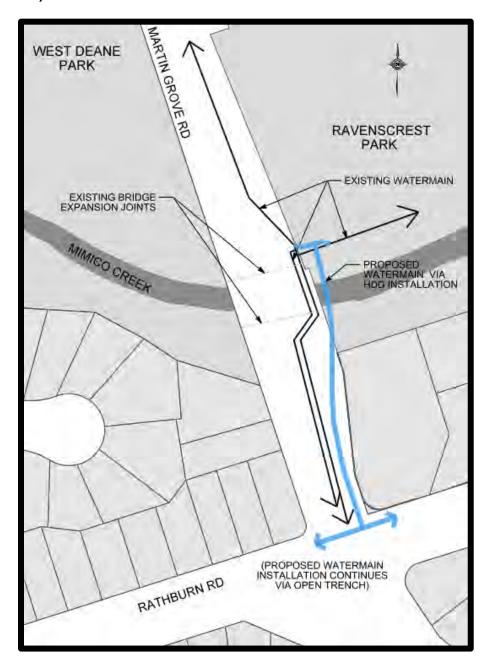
Alternative #4: Watermain aligned east side of Martin Grove Road / Bridge
